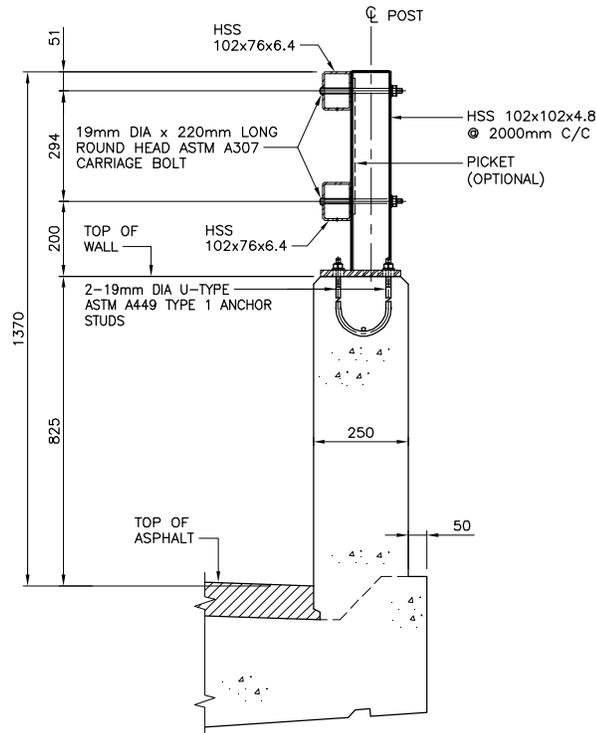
Parapet Wall with Two Tube Combination Traffic/Bicycle Rail (TL-4)
